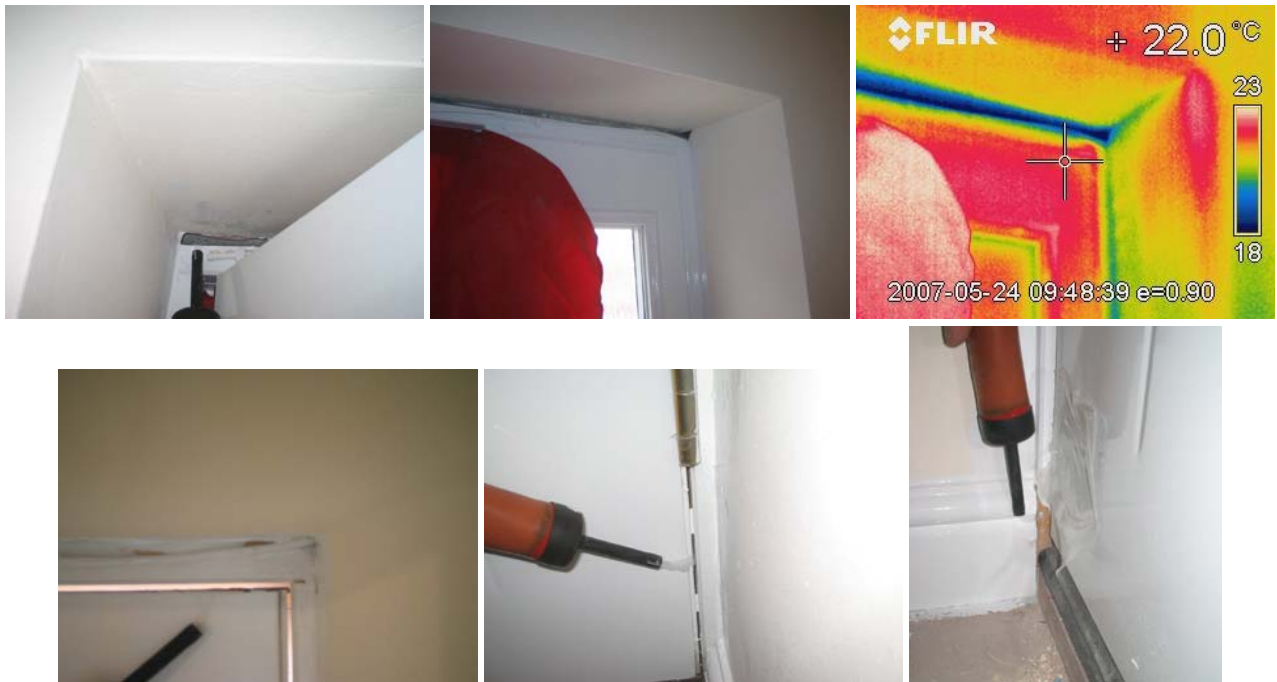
Air leakage at the unfinished head of the front door and at the back door, where the draughtstripping was not yet installed and at the threshold.
